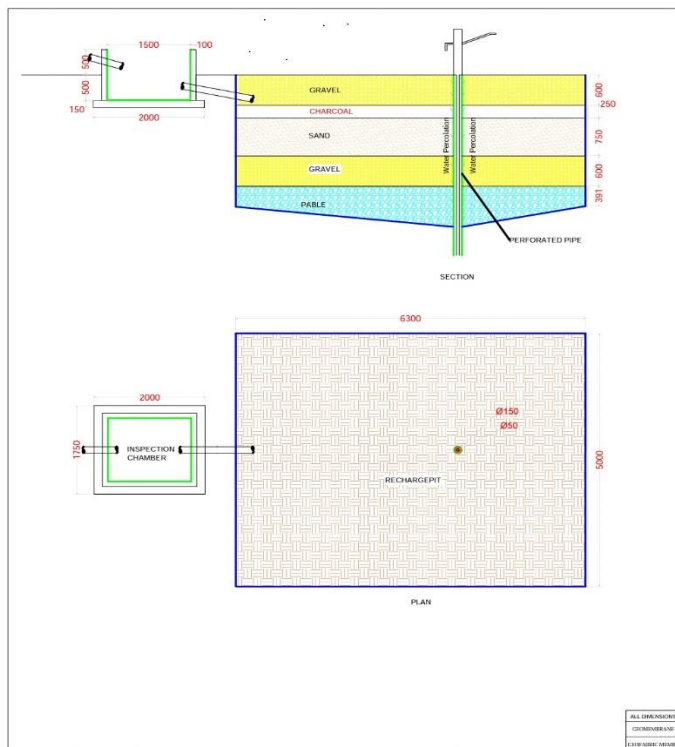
Plan and section of inspection chamber and recharge pit
